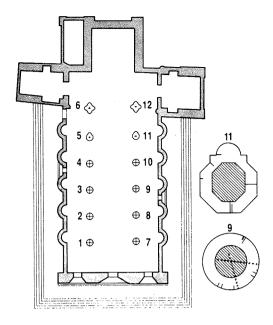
Plan of the Cathedral. Typical sections of the pillars and columns are shown with the indication of the observed cracks.
